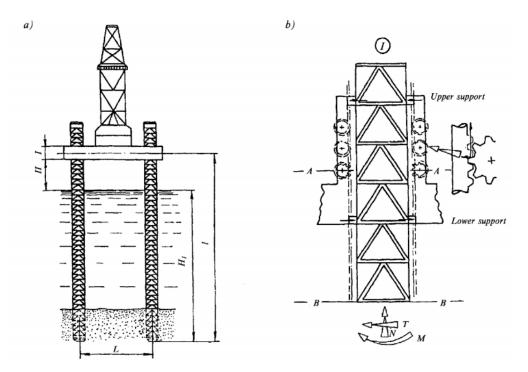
Idealization of self-elevating MODU structures of different levels: a) structural frame ("superelement"); b) leg section (I) under consideration
